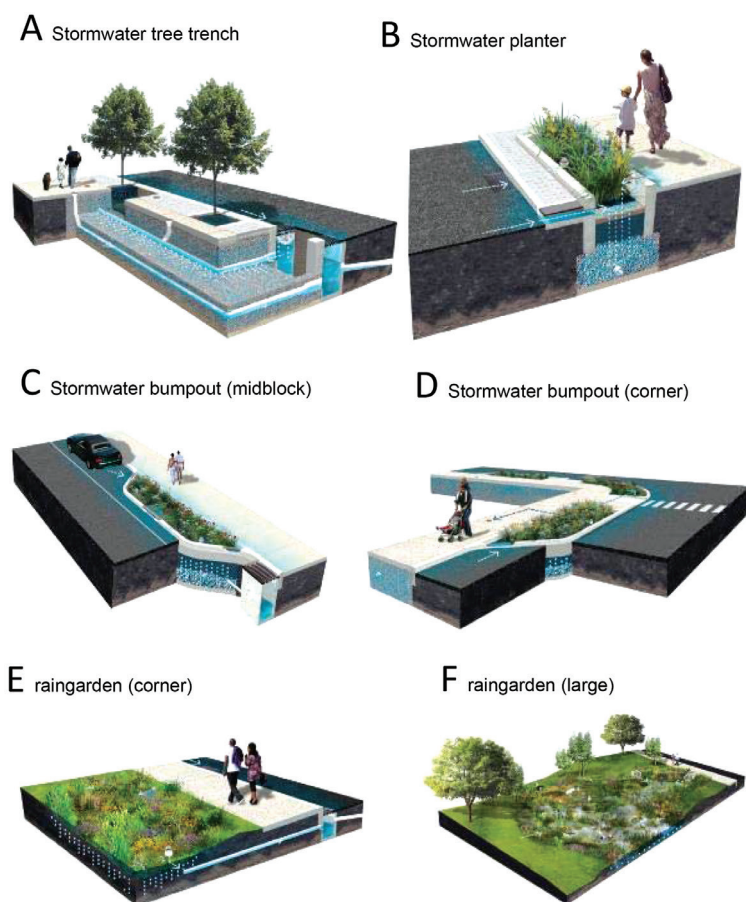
Storm water Management Practices, Philadelphia (source: [17]): A.Stormwater tree trench, B) Stormwater planter, C) Stormwater bumpout (midblock), D) Stormwater bumpout (corner), E) raingarden (corner) F) raingarden (large)
